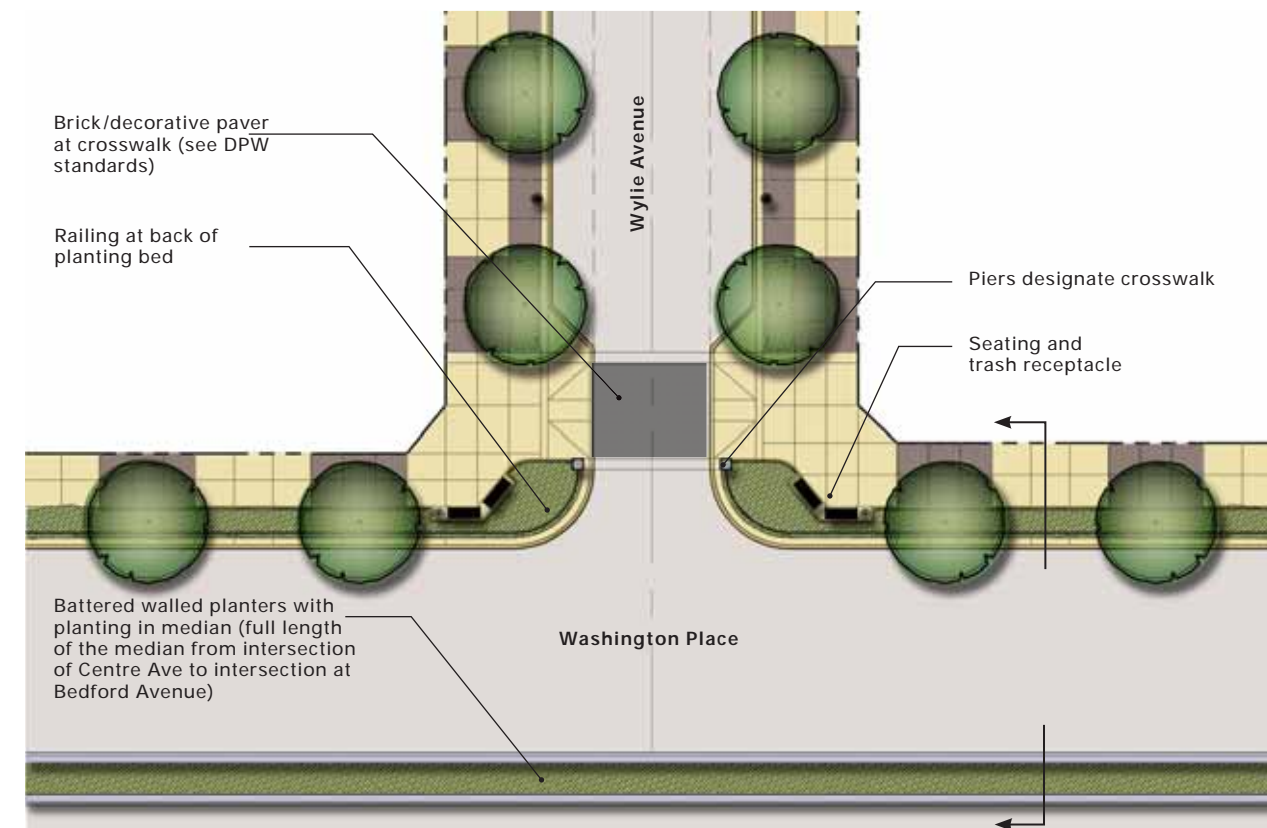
Enlarged section and plan of barrier control at intersection of Wylie Avenue and Washington Place. Battered wall planters, similar to the planters at Grant Street will be used in the median along Washington Place. At the intersection, a railing, planting bed, and street trees will help deter cross block pedestrian traffic.
